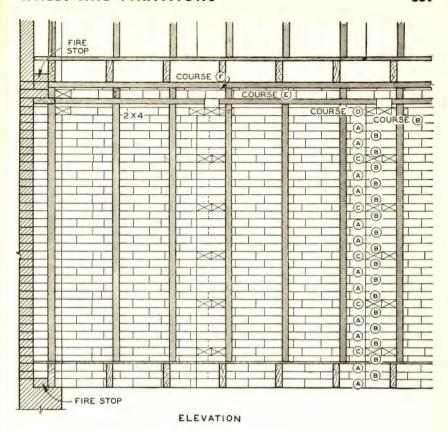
Plan Showing Construction of Economy Wall by Courses
